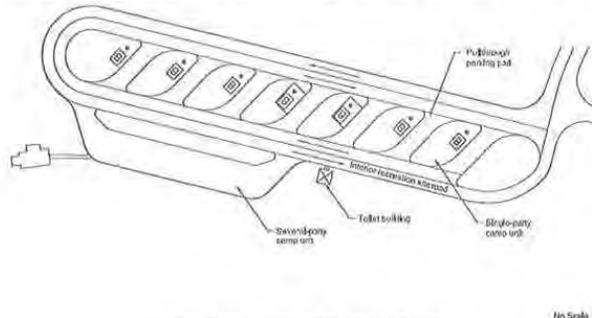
A campground loop road in a restricted space with a high level of development.
